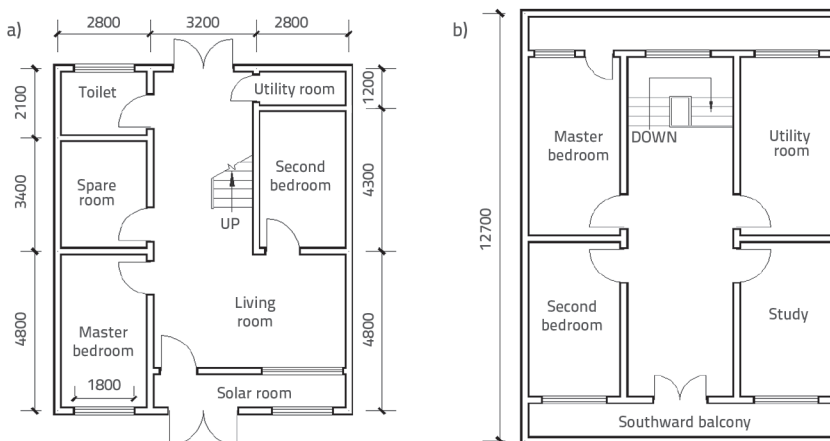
Optimized space division scheme [mm]: a) Plan of the first floor; b) Plan of the second floor
